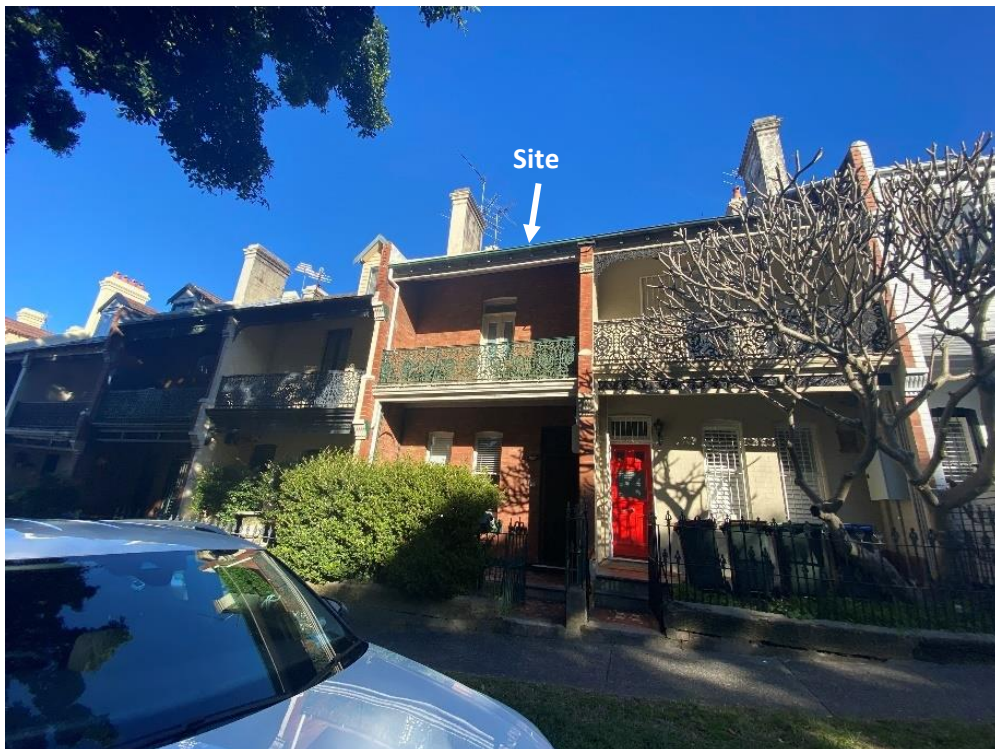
View of site and adjoining properties, looking north from Watkins Street
